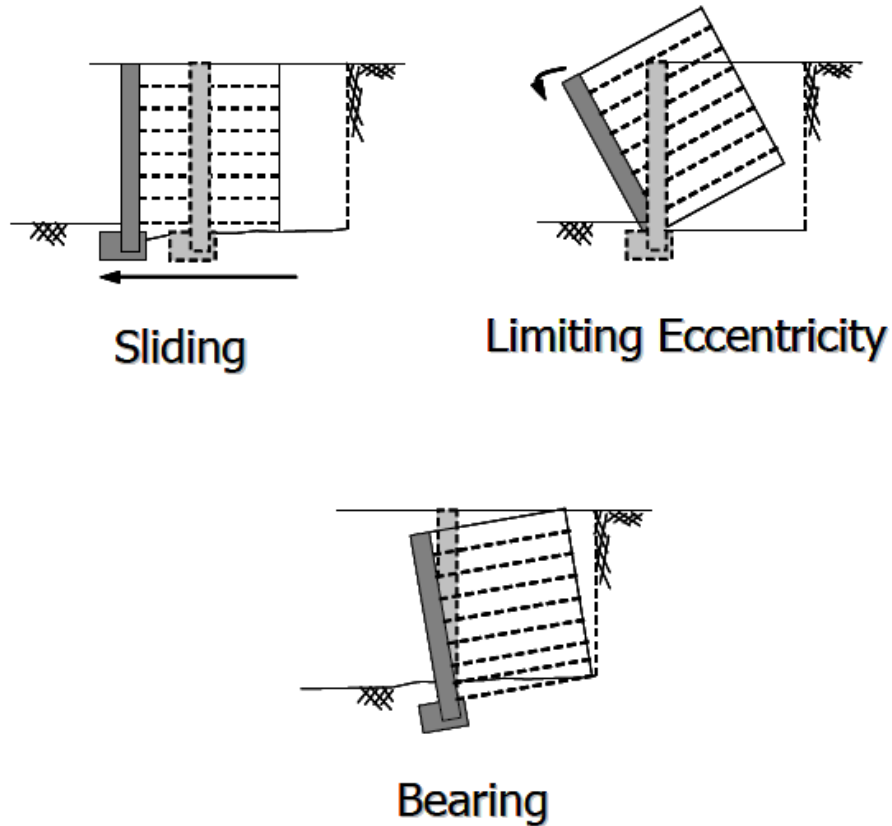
Schematic of external stability failures in MSE walls (Berg et al. 2009).
